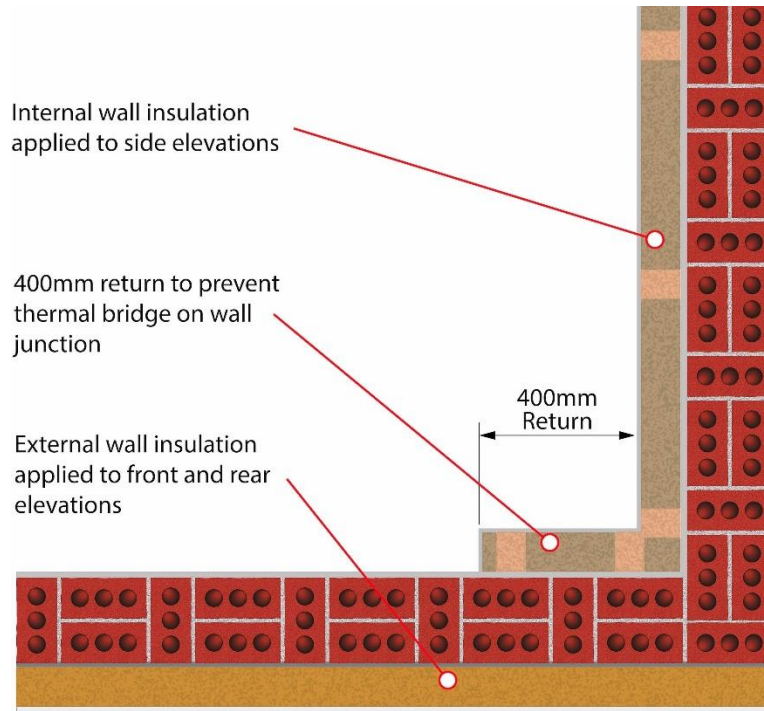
Section through hybrid EWI/EWI Insulated wall junction showing required return.
